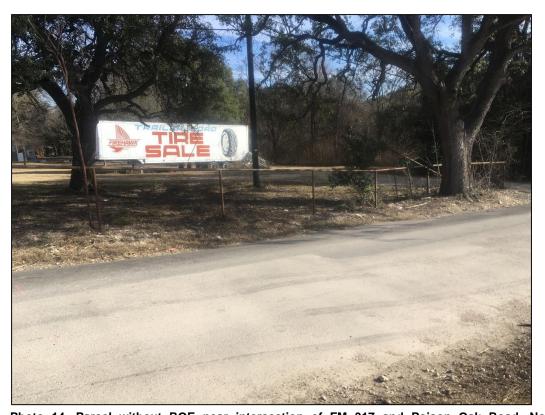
Parcel without ROE near intersection of FM 317 and Poison Oak Road. Note landscaping disturbances. View to the northeast.
